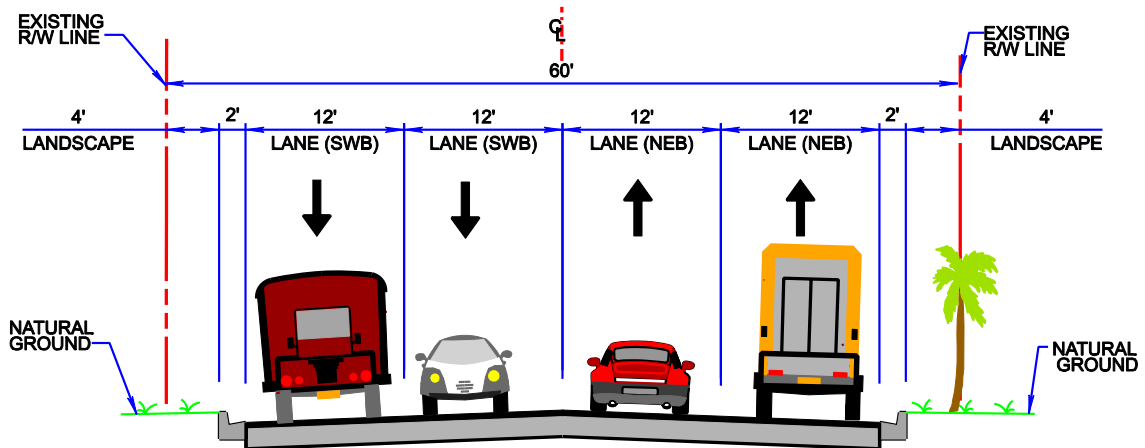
C NW 138th Street from NW 113 Avenue to FEC Railroad (2018)
